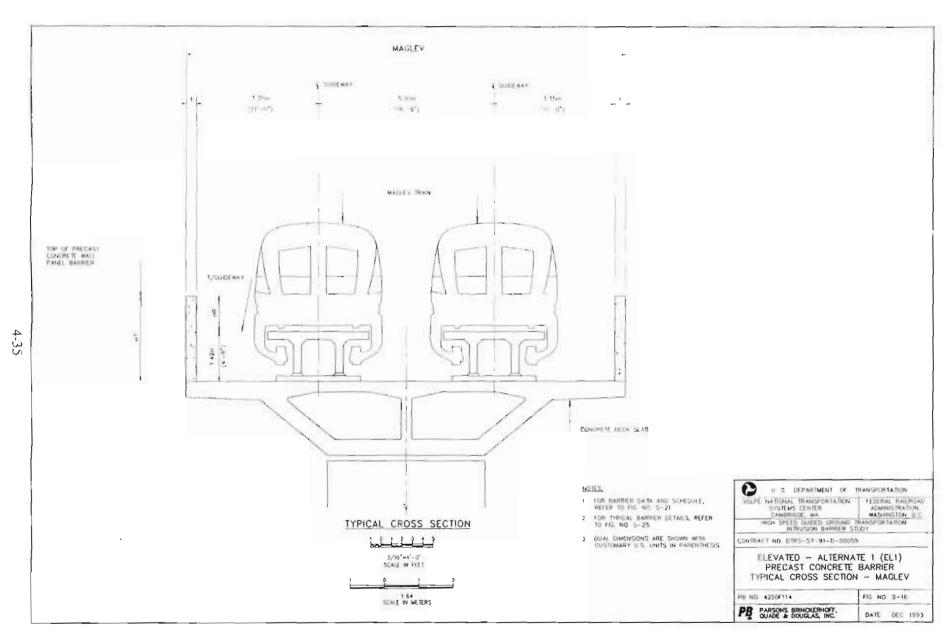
ELEVATED ALTERNATE 1: PRECAST CONCRETE WALL - TRANSVERSE SECTION/MAGLEV
